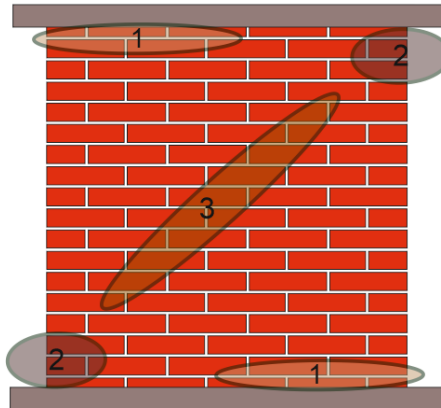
The reasons of the cracks on the masonry wall
